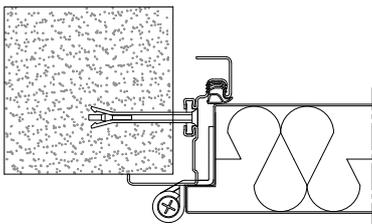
Installation of an opening frame with a thermal break using anchors directly through the opening frame
